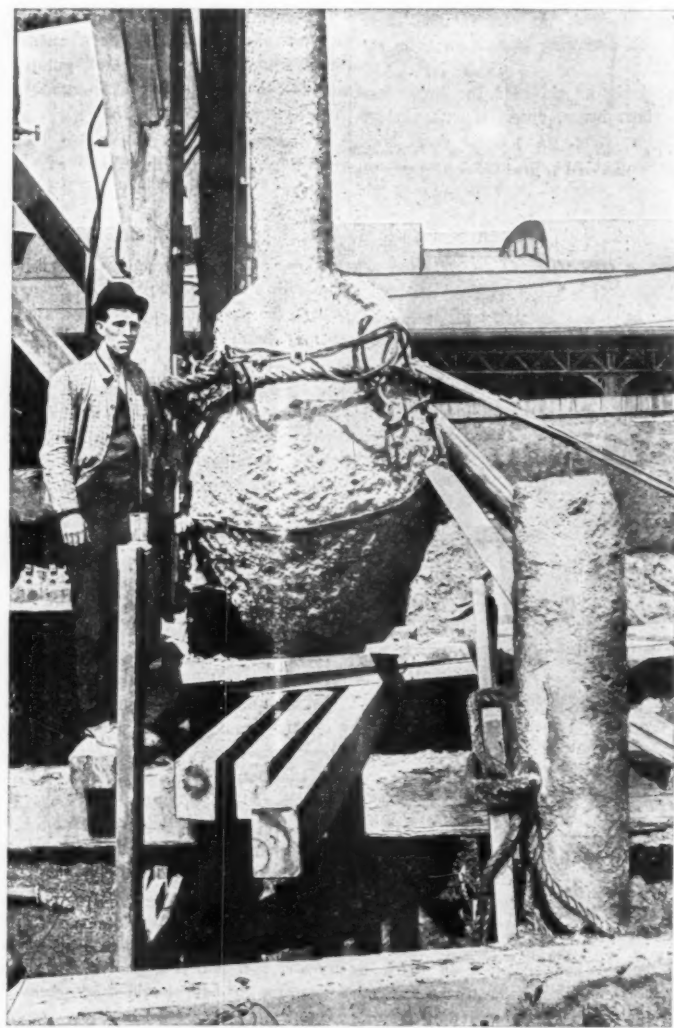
PEDESTAL CONCRETE PILE FOUNDATIONS.
